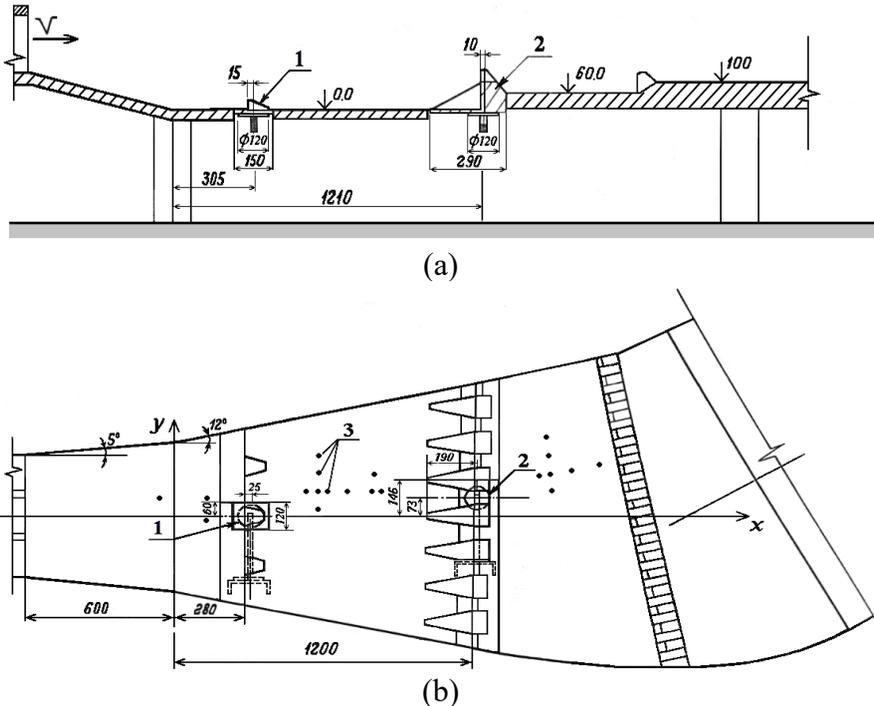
Installation diagram of sensor dampers (1) and point sensors (2) on the spillway model of the Shamkir hydroelectric complex: a) longitudinal section along the axis of the outlet head; b) plan of the exit section
